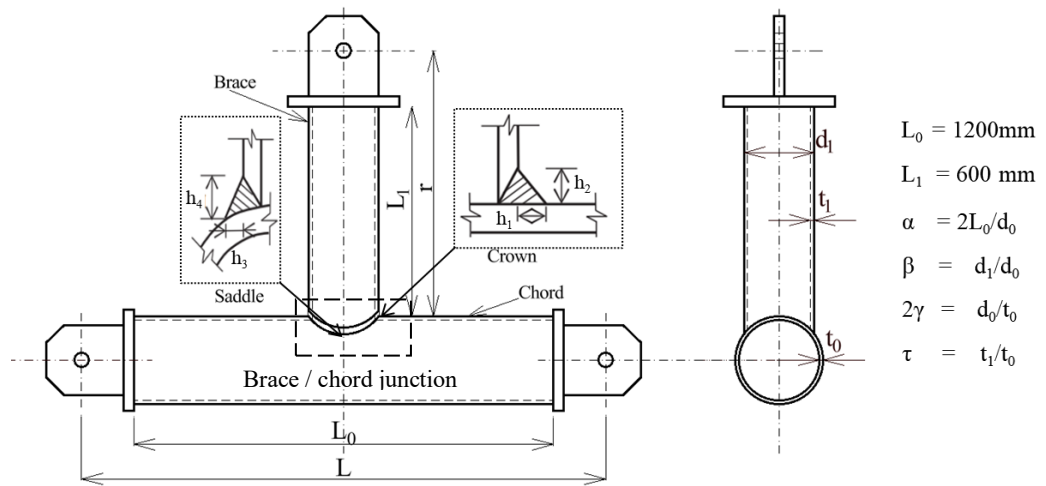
Configuration of typical welded T-joints between S690 CHS
